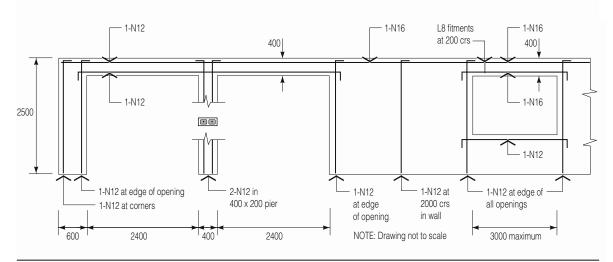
Wall Reinforcement for 190-mm Leaf for Wind Categories N1, N2 and N3 and 2500-mm Wall Height
